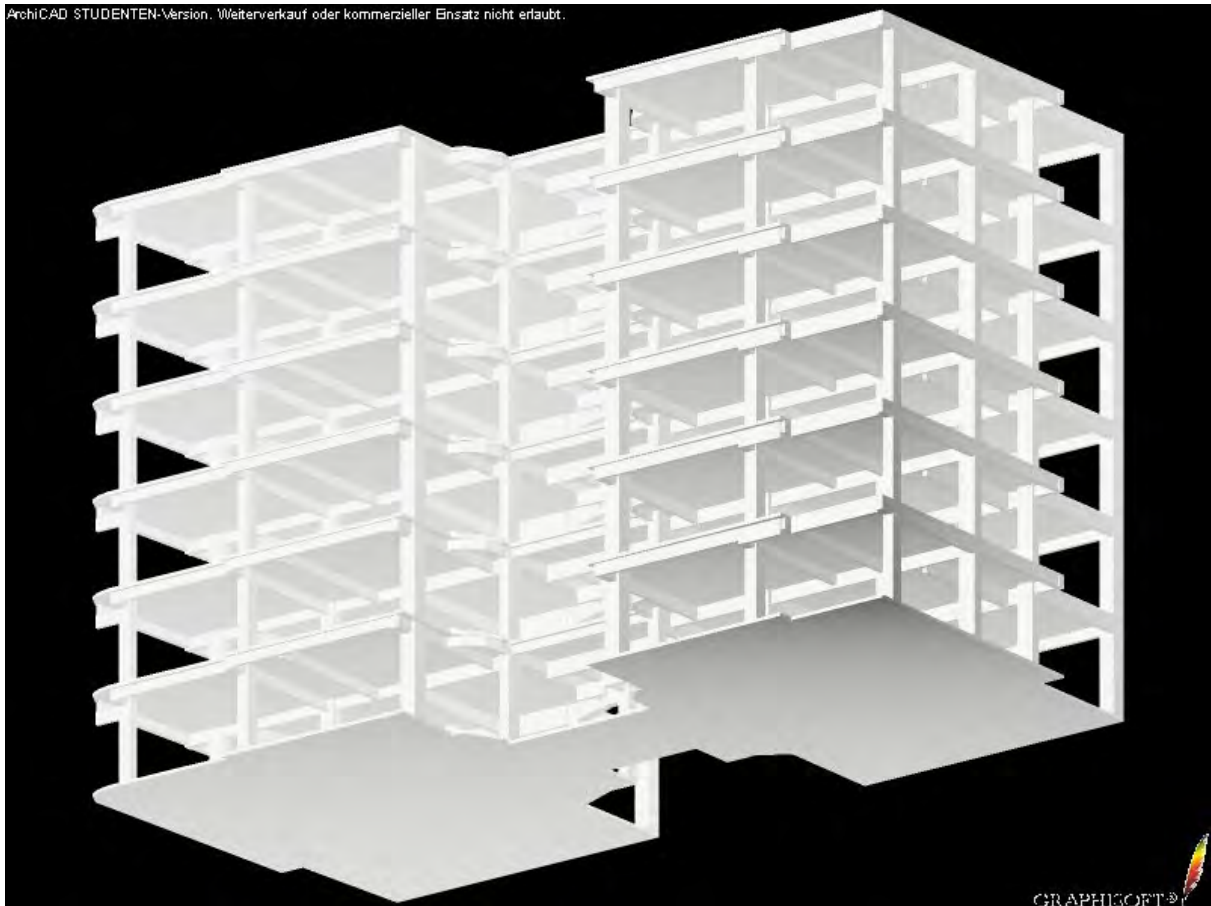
Load bearing structure of a typical building (from Bostenaru, 2004)
